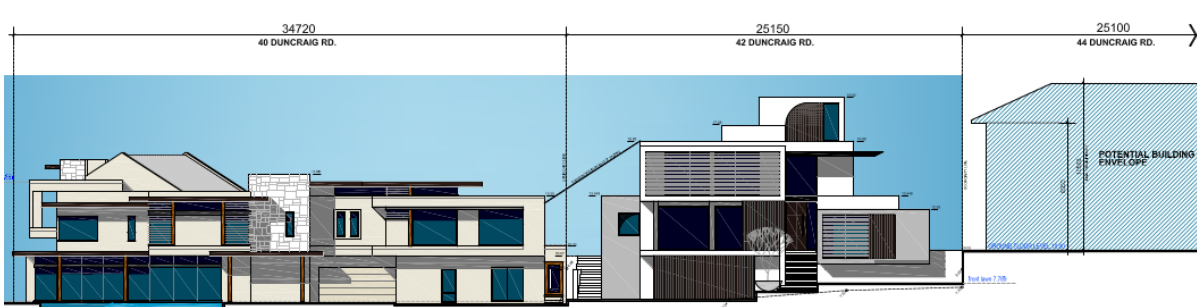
Duncraig Road streetscape with permitted building heights on the adjoining vacant site at 44 Duncraig Road
